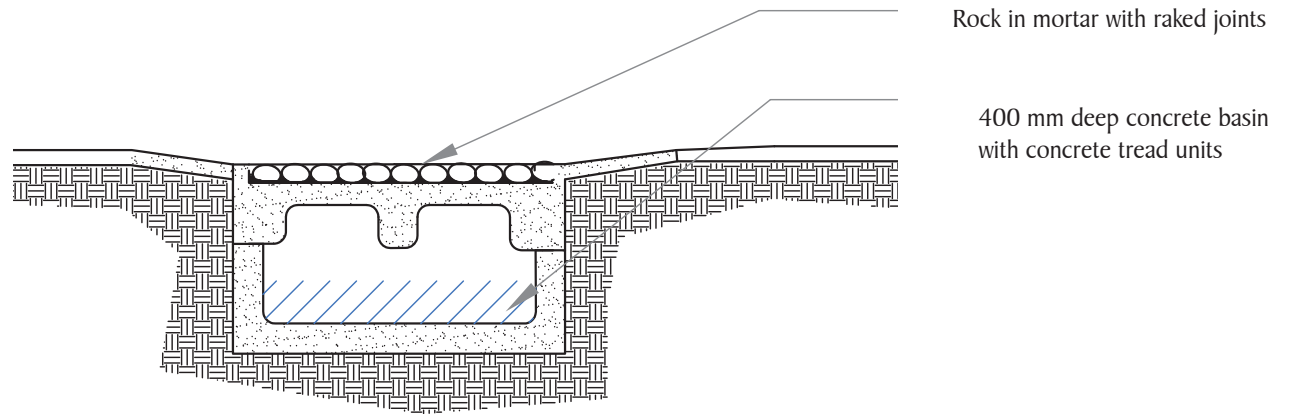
Typical section of drainage channels toward stormwater feature. (Author, 2008) Scale 1: 25
